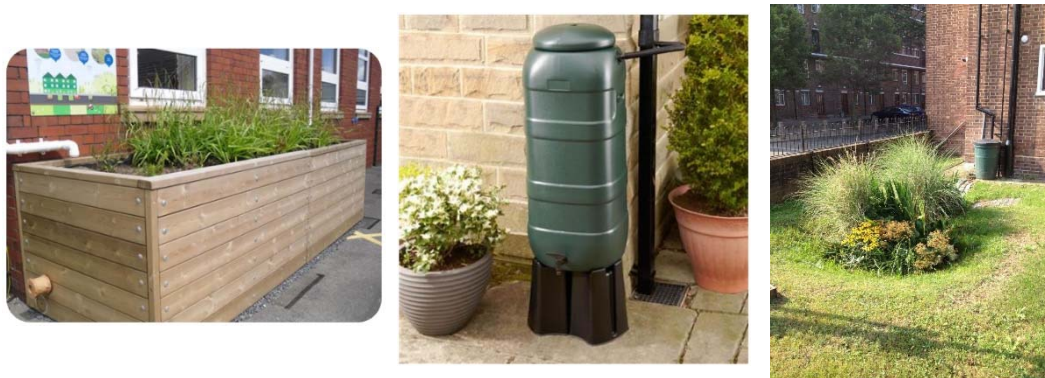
Examples of Downpipe planters, Water butts, and Rain gardens
